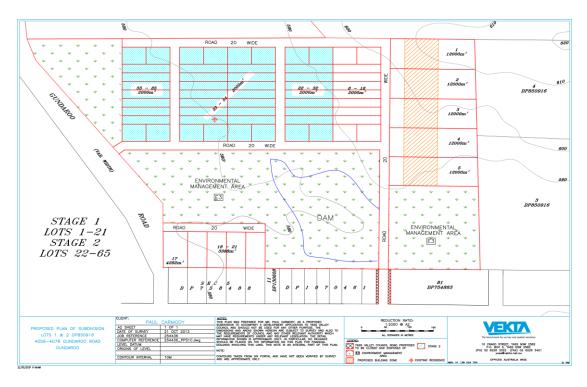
Plan of the proposed subdivision (Vekta 2013).
